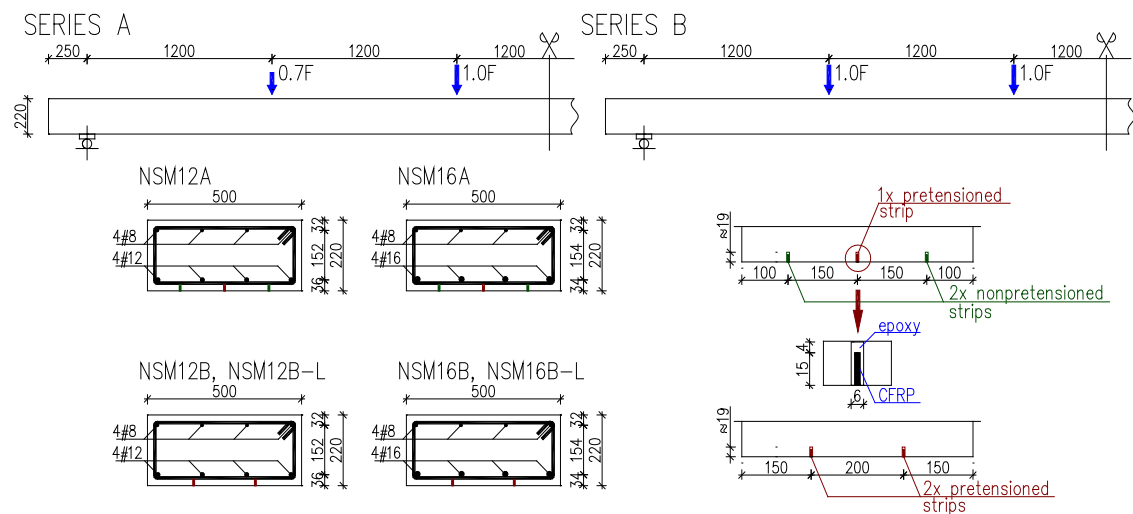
Static schemes, specimens cross sections and strengthening arrangement
